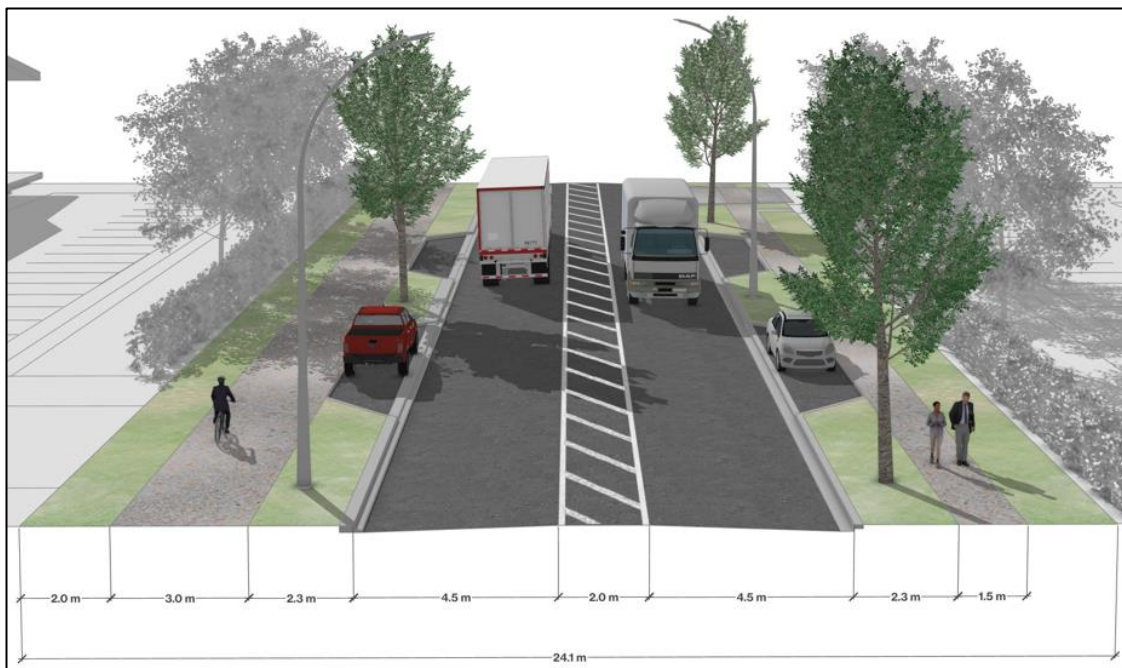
c) Indicative Typical Cross-section of the Te Rapa Structure Plan Collector Roads (Central Spine)
